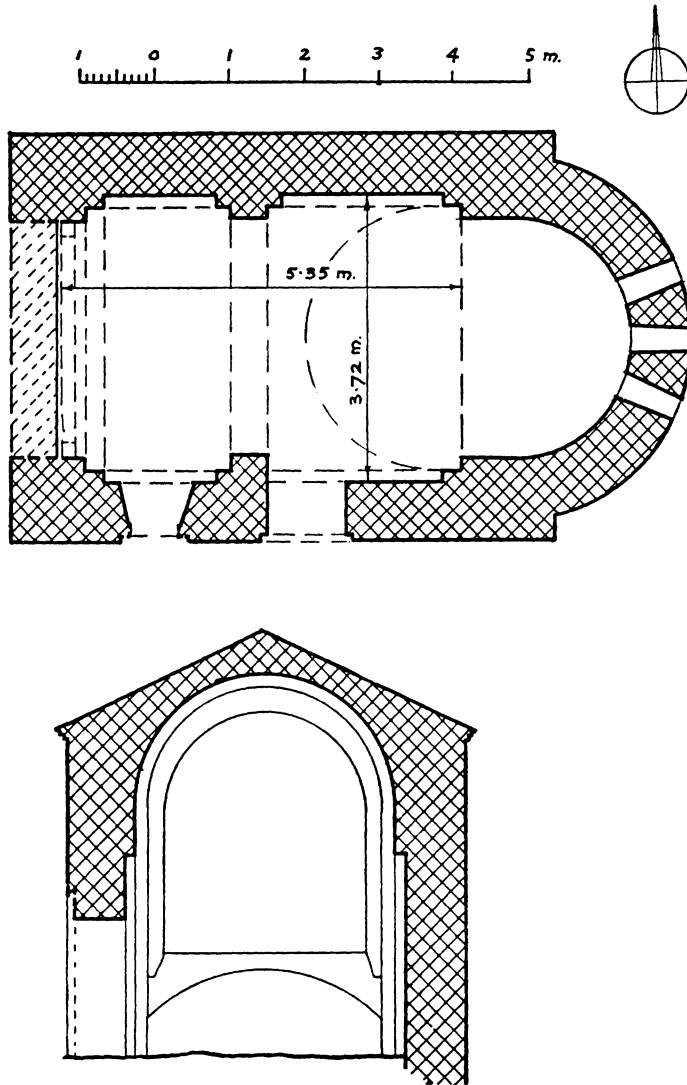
Plan, and section looking west, of church at Orta Mahalle, Akçaabat.
